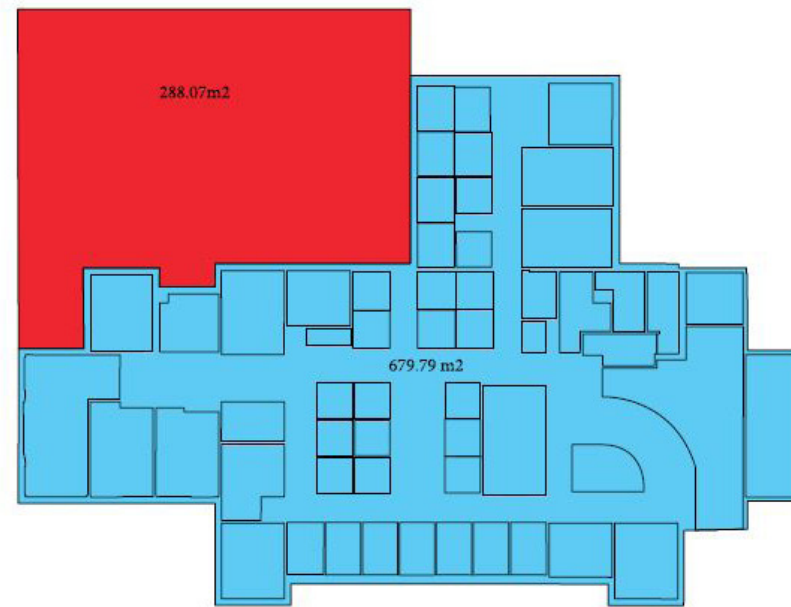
Configuration B – Floor 2 – Two Storey Expansion
